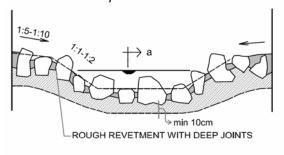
Culvert bottom protective revetment for falls up to 5%
